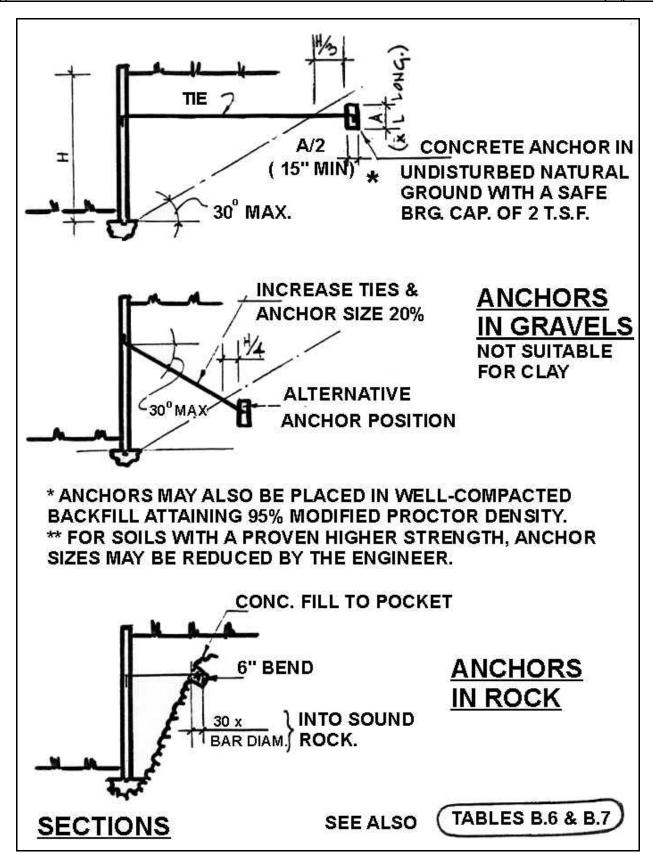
Concrete retaining wall with tie-back to anchor, H = 0 to 32 feet (Bernier, 1995).
